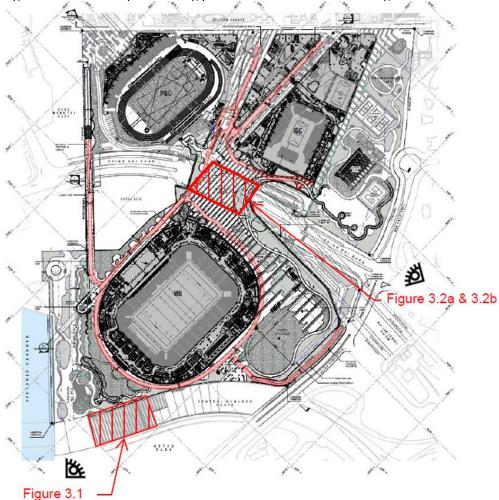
KTSP Site plan showing podium deck structure above Shing Kai Road
